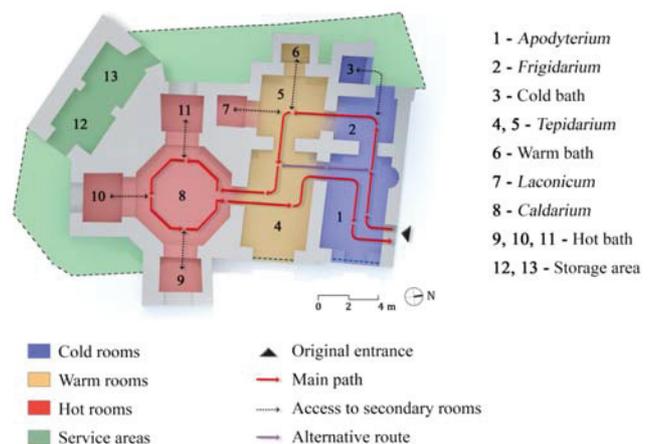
Schematic plan of thermal complex with supposed bathers’ routes
